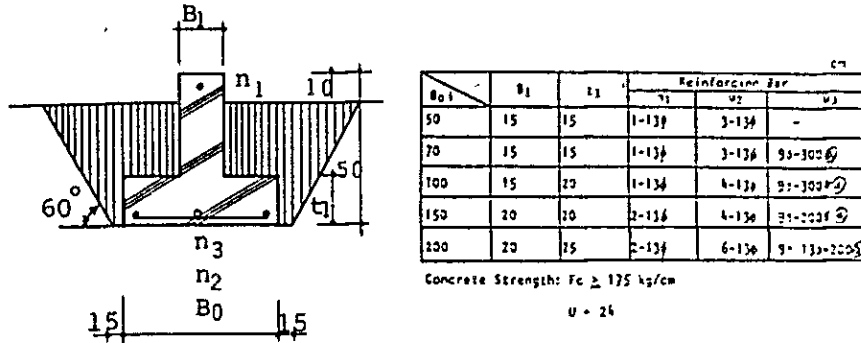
RC-CONTINUOUS FOUNDATION DETAIL
